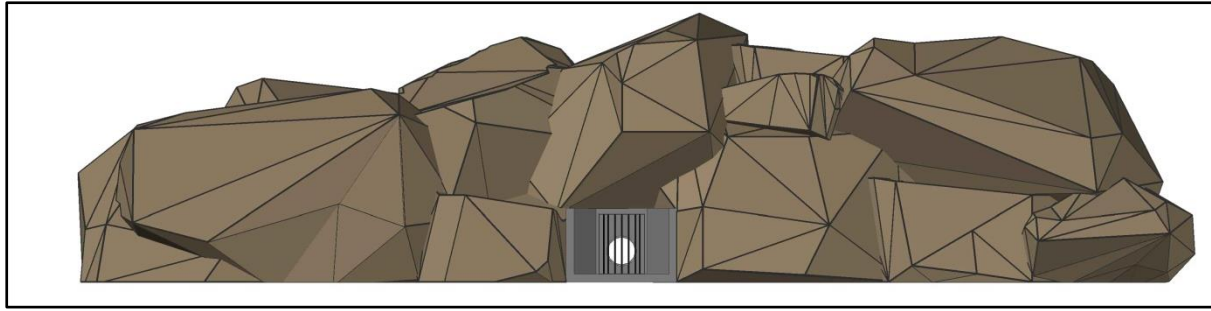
Potential Future Outfall Natural Stone Revetment
